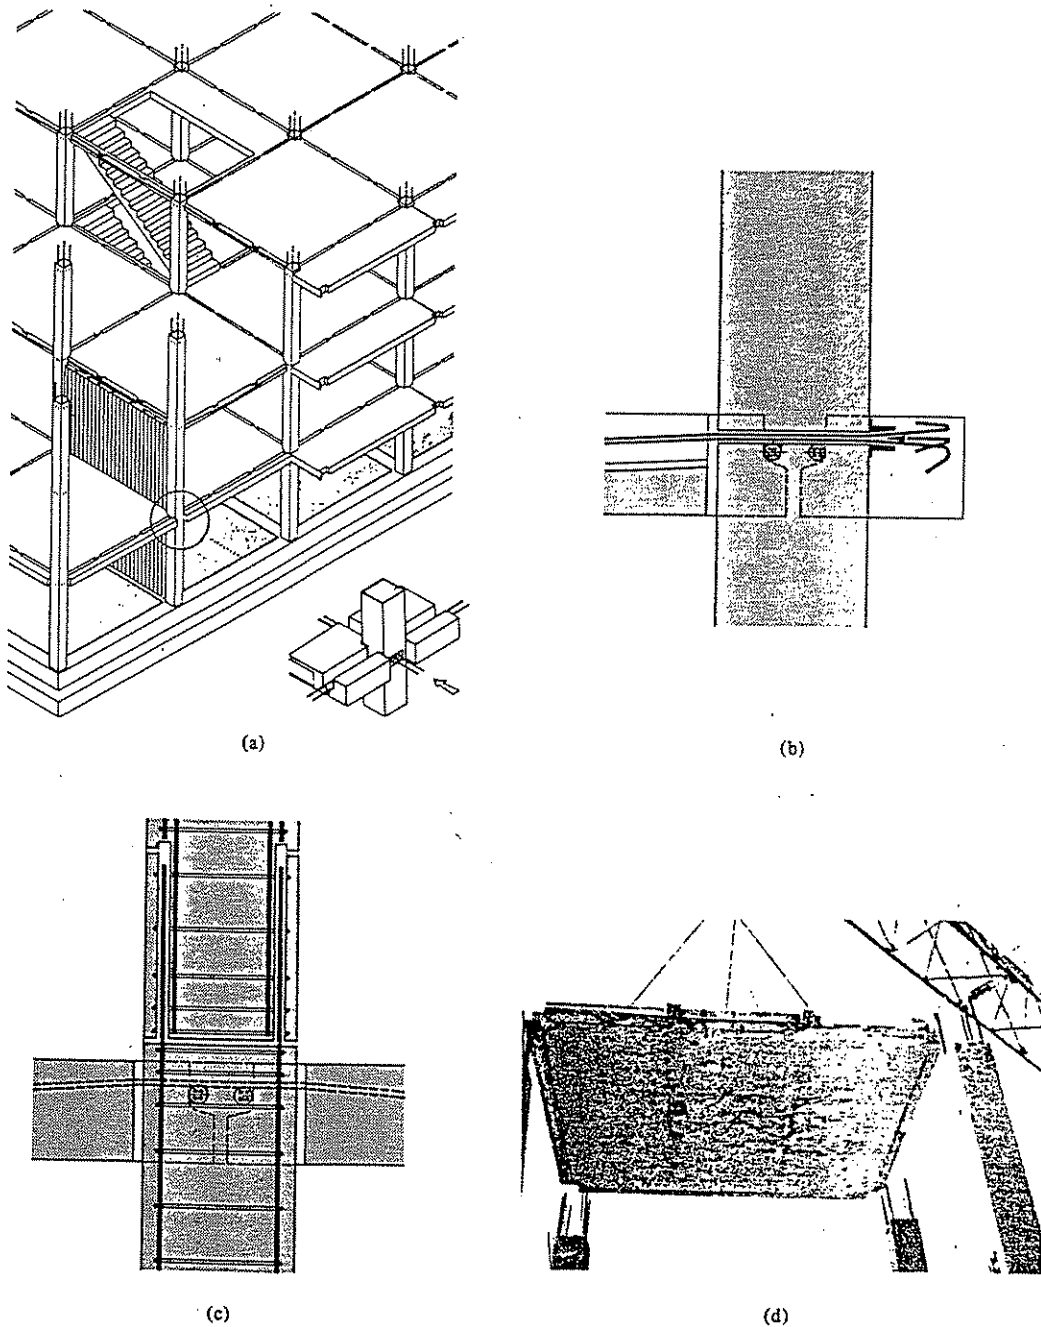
IMS system (Yugoslavia): (a) general scheme; (b),(c) prestressing and columns connection; and (d) picture.
